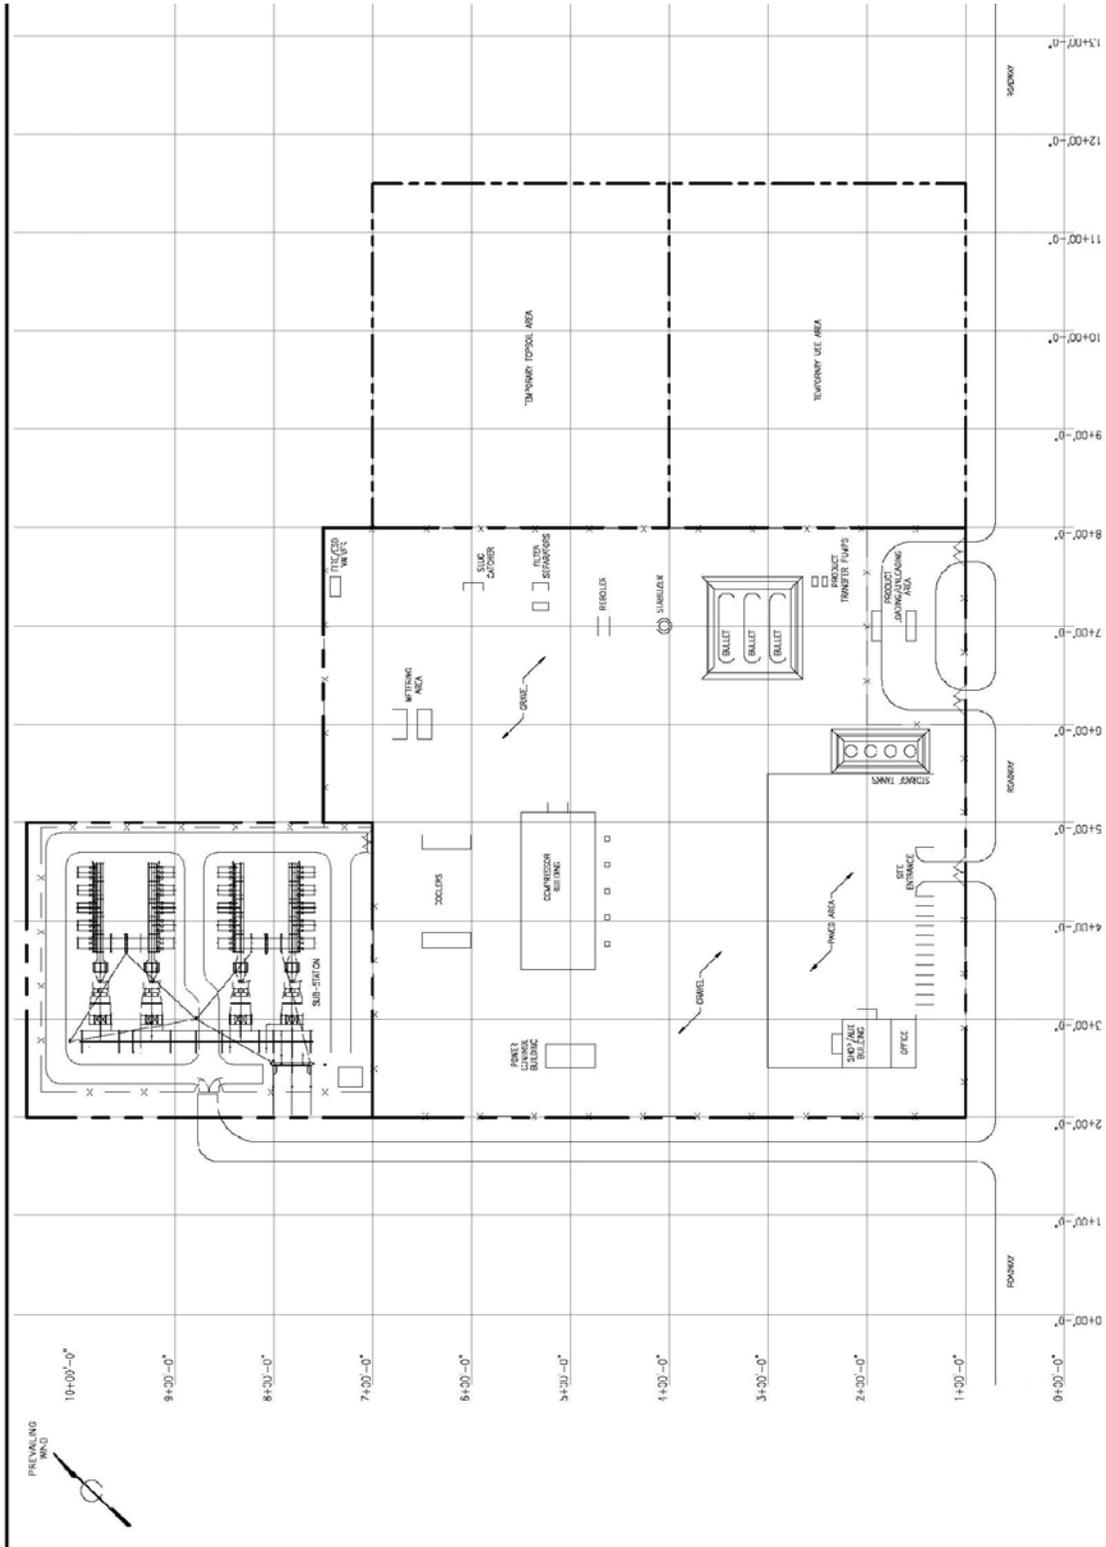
Plan View of the Proposed Bridger Compressor Station.
